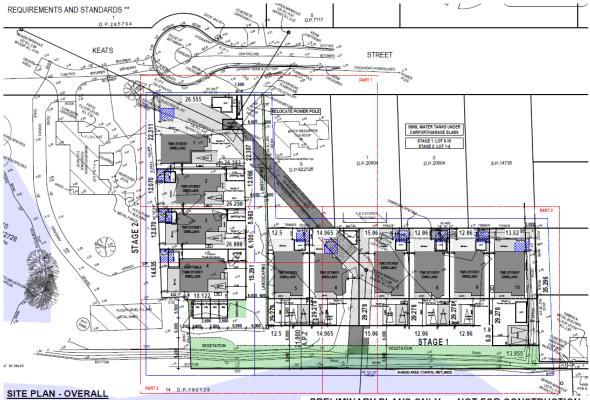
Site plan showing location and layout of proposed dwellings, swimming pools and associated infrastructure and landscaping.
